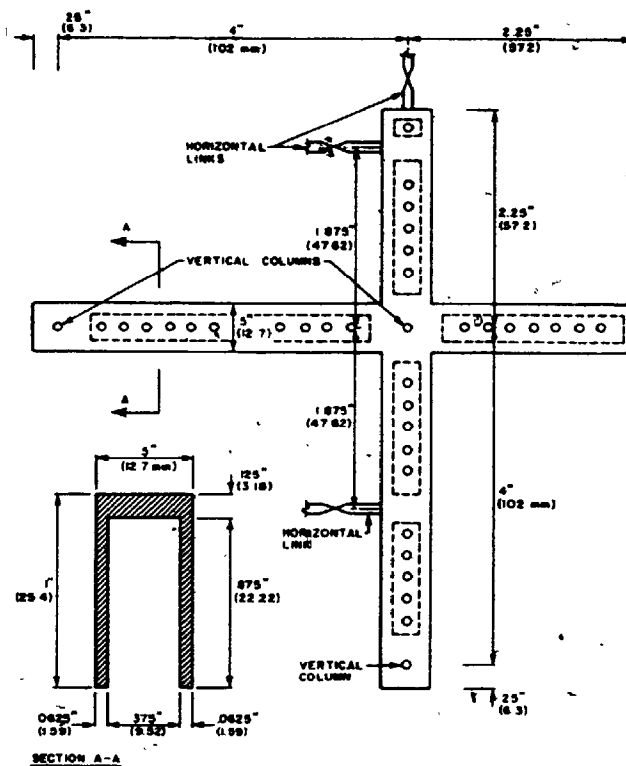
PLAN VIEW OF THE GIRDER WITH DIMENSIONS
